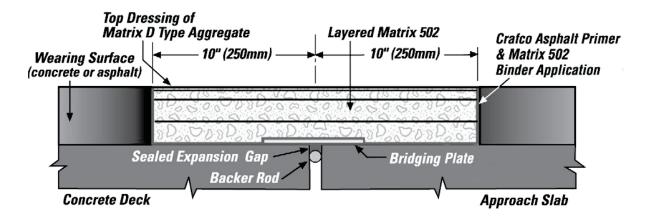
Typical Matrix 502 Asphaltic Plug Bridge Joint System
